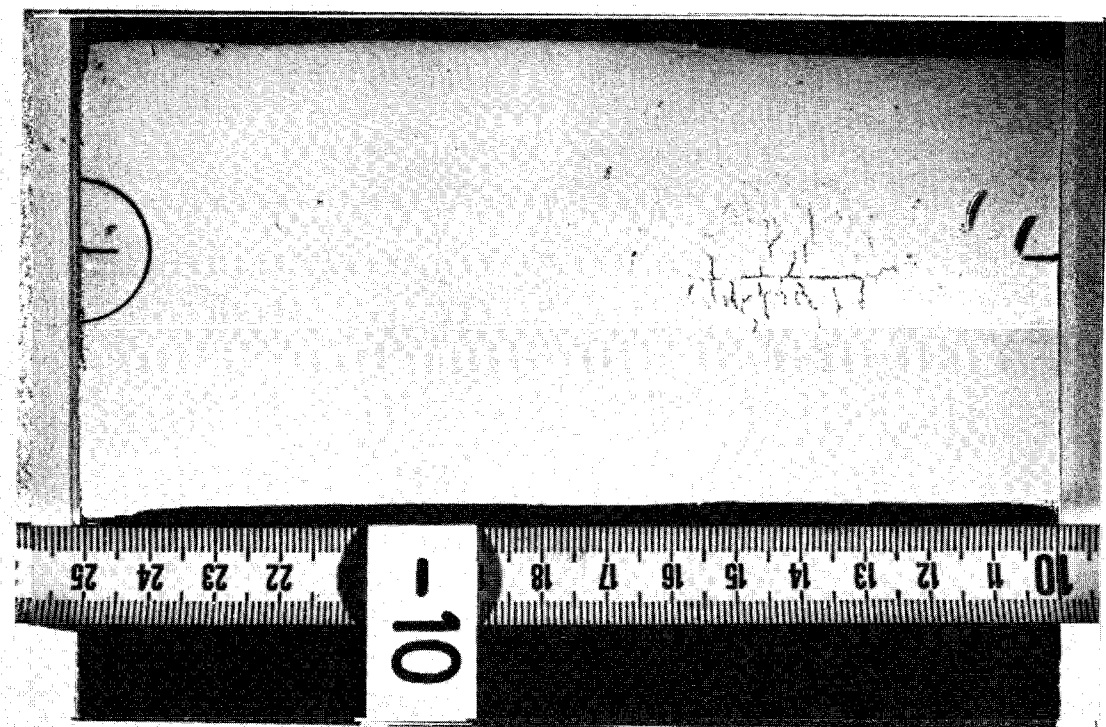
Specimen No. 10 : crack offset : - 4 mm
